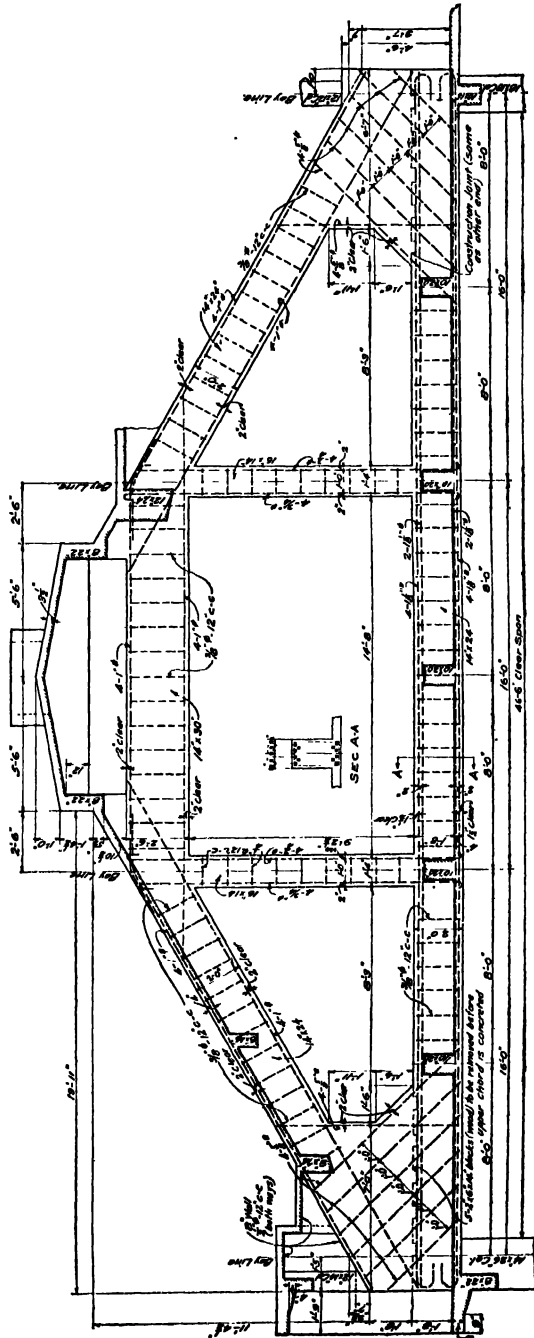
Detail of Queen rod trusses, Fulton Co. Court House, Atlanta, Ga.
